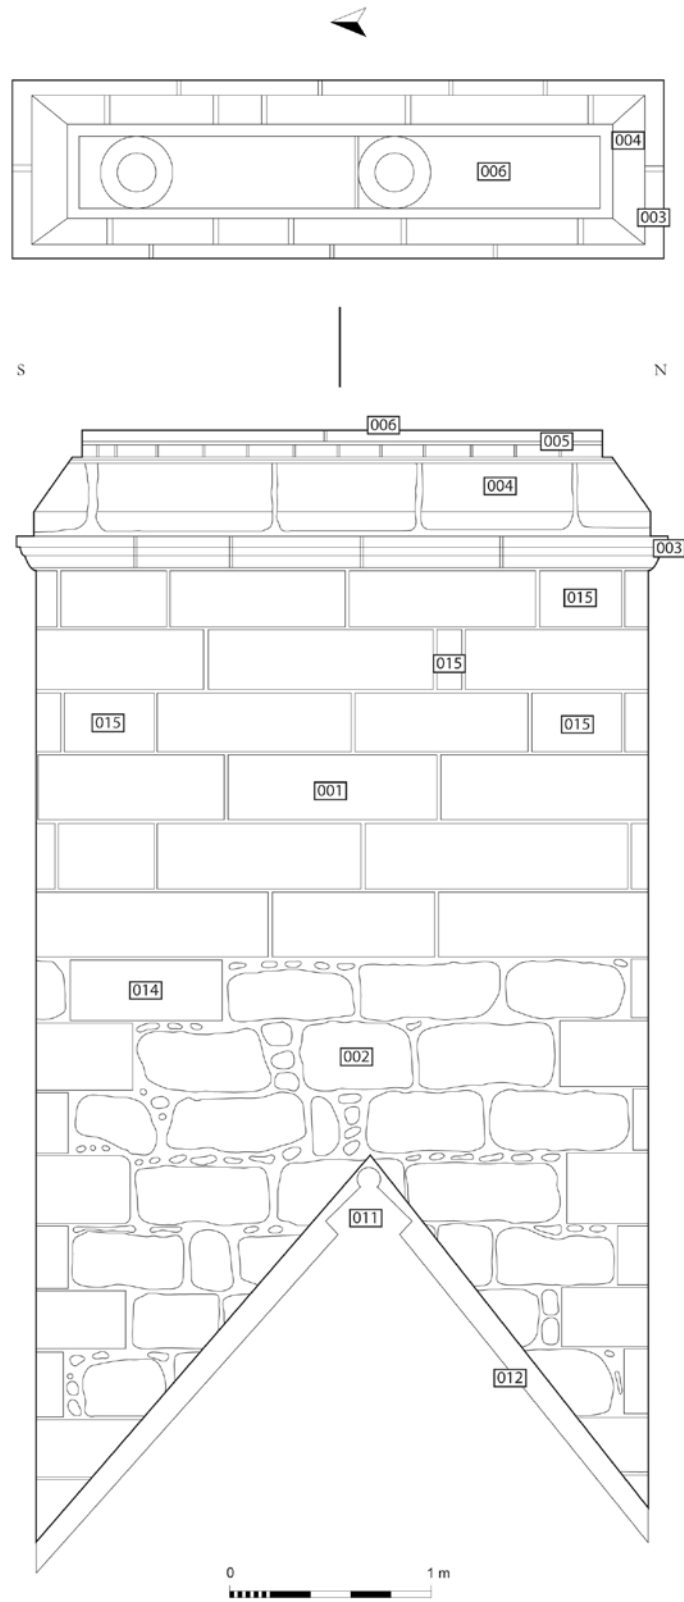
Chimney RC06 plan (top), and eastern elevation.
